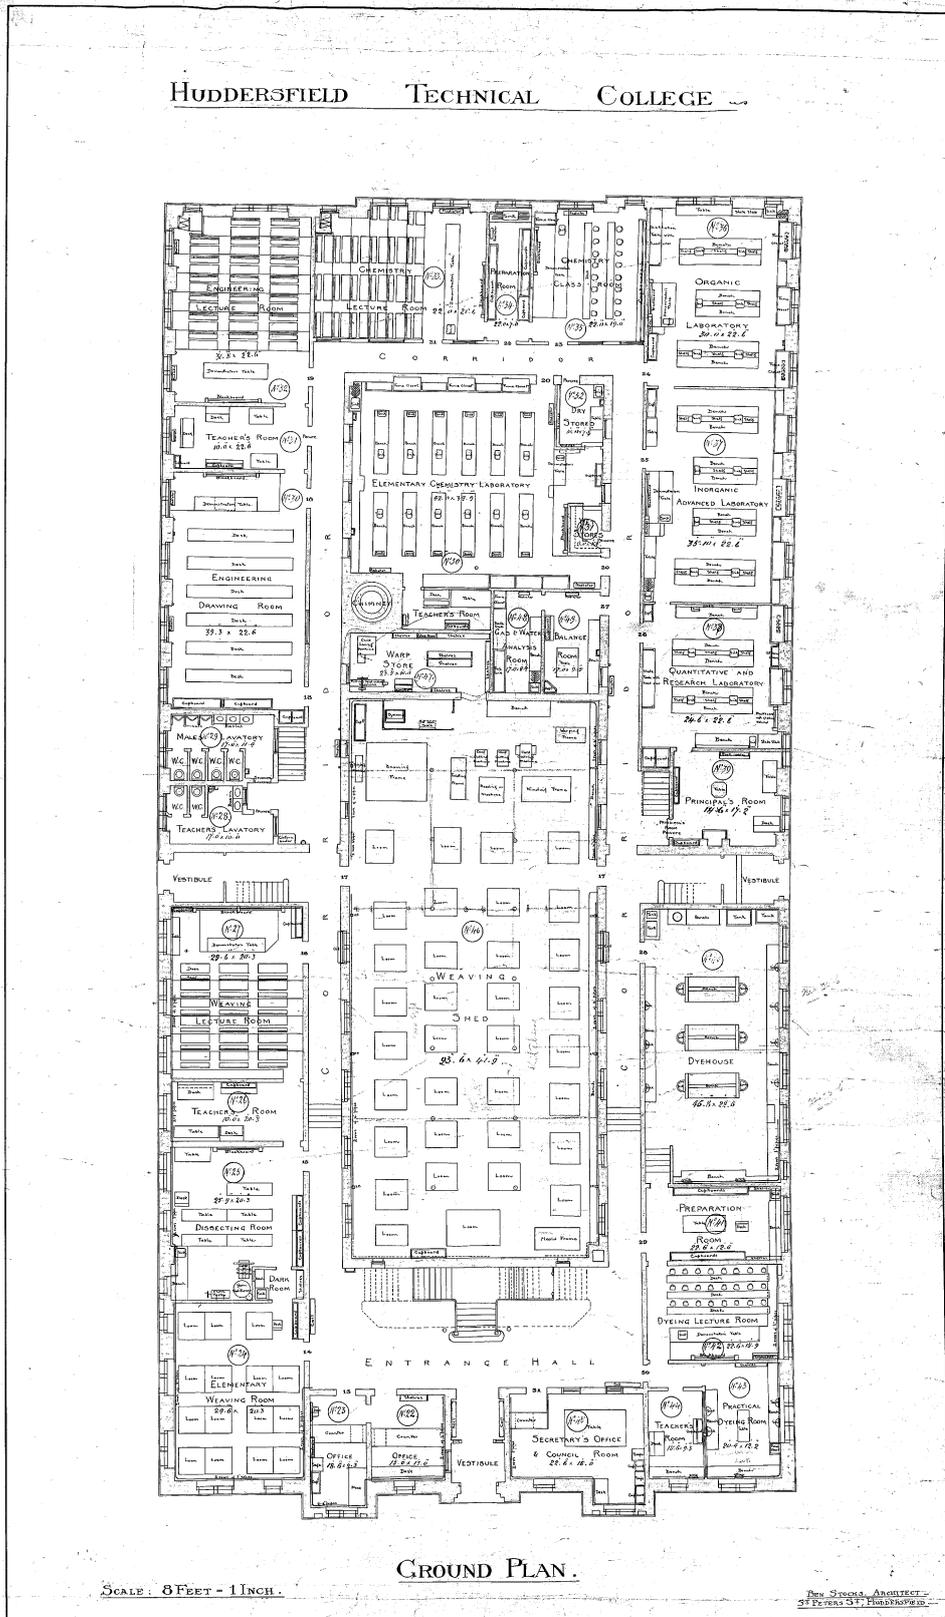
B Stocks 1900 Ground Floor Extension Drawing
